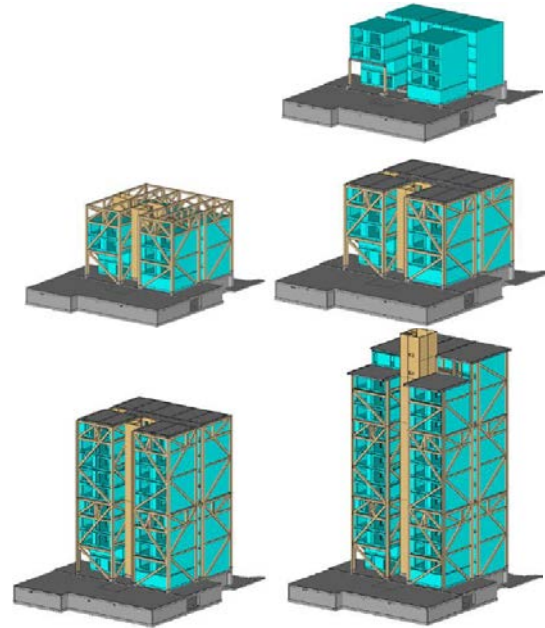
Treet building and construction phases, Images source: (Malo et al.,
